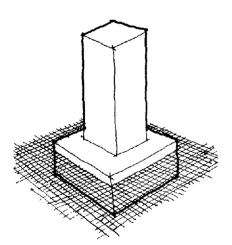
Narrow towers on broad underground bases, typifies many buildings with integral parking structures. Engineer S.B. Barnes has discussed narrow towers on broad bases which result from the influence of parking requirements on building form (1).
